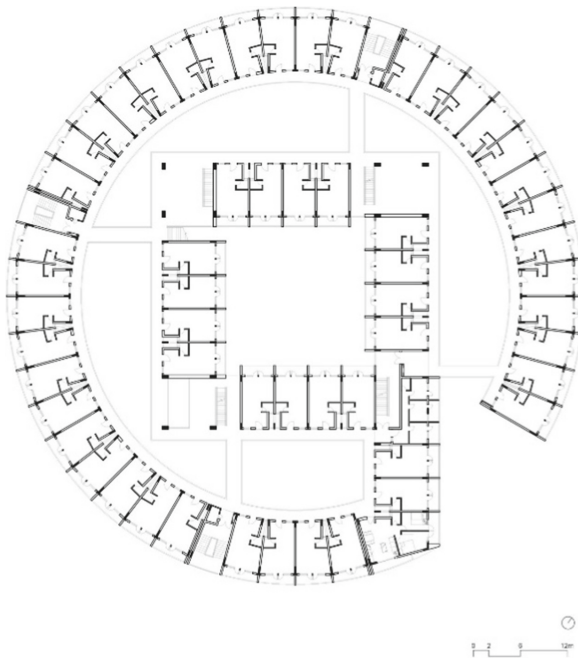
The floor plan to show a ring shape of Urban Tulou, Shenzhen, China, 2010. [<https://architectureindevelopment.org/project/346>]
